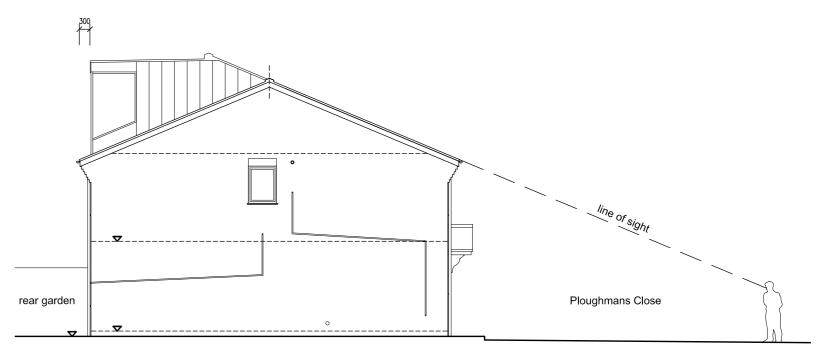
AS PROPOSED SIDE ELEVATION AND STREET SECTION DIAGRAM
